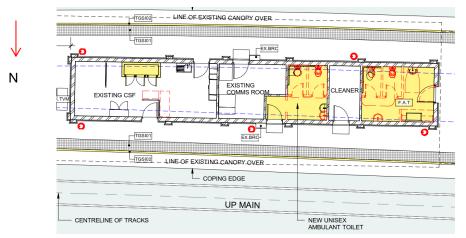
Proposed platform building layout (Note: North is south of the plan)
